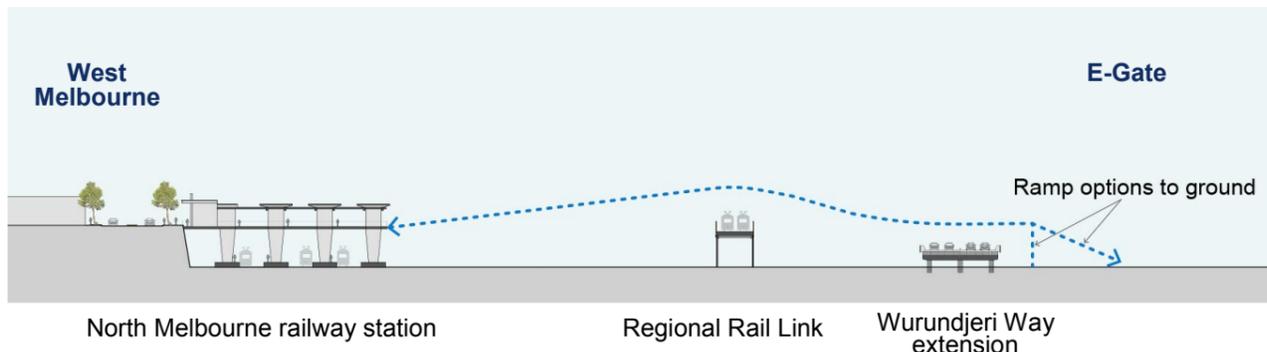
Indicative plan of possible future pedestrian/ cycle connection between existing rail operator pedestrian overpass and the E-Gate site
